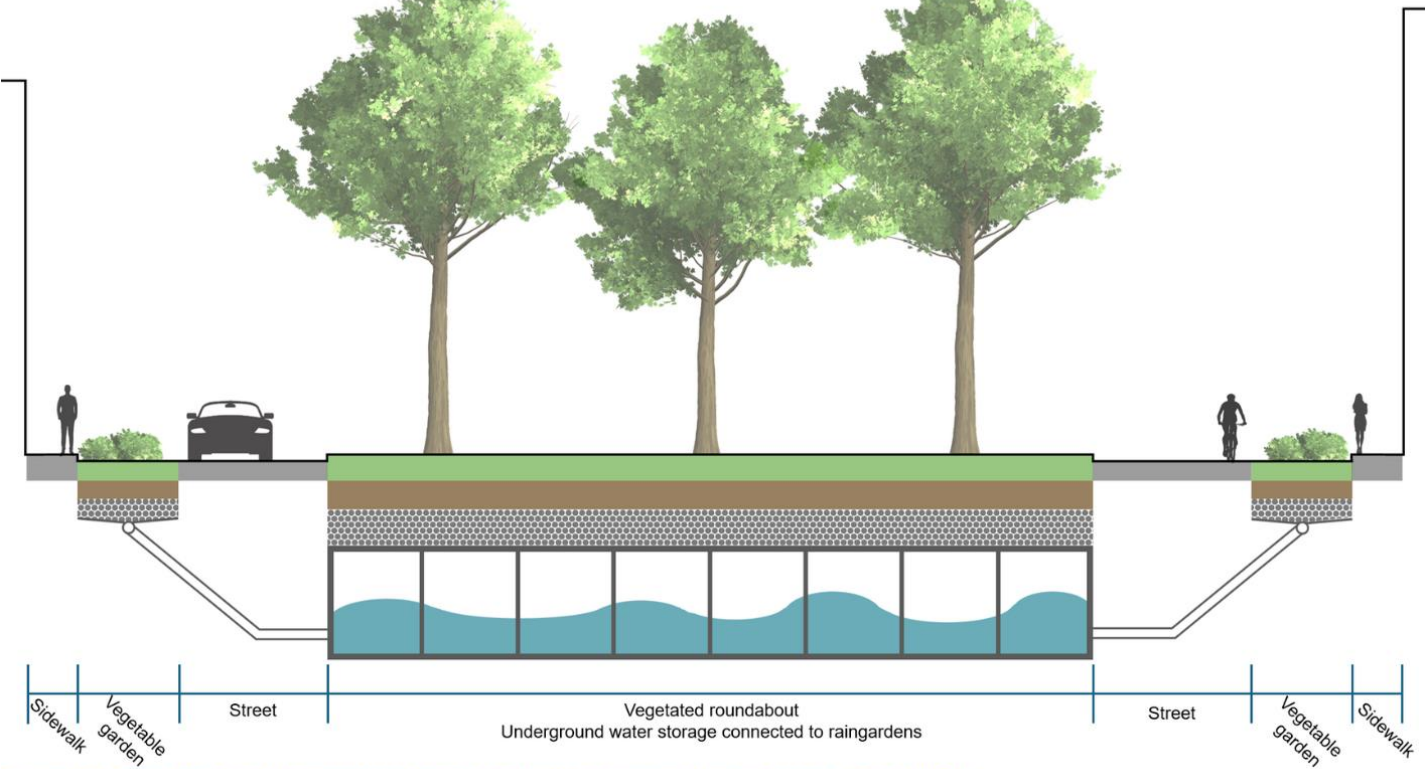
Cross-section of the vegetated roundabout with underground water storage (Stuut, 2024)
